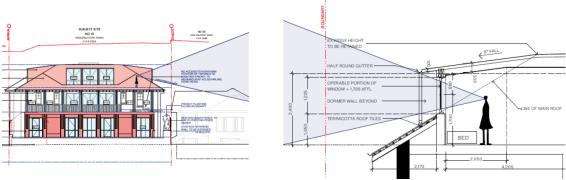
Sightline from attic level windows toward No.23 Darling Point Road.
